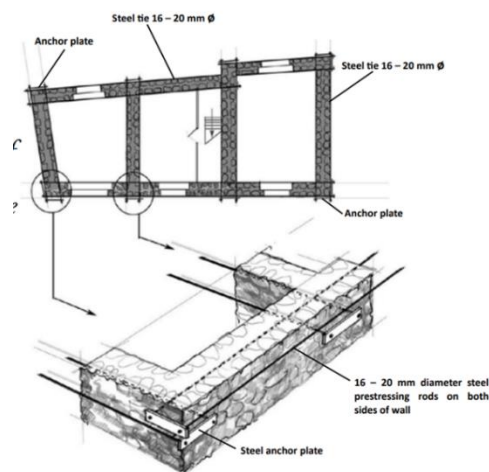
Plan view of a building displaying the layout of steel ties and anchor plates (Tomazevic, 1999).
